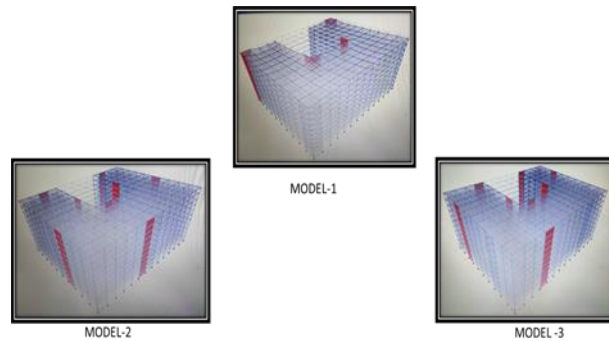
3-D view of G+10 building for different models (bracing & shear wall)
